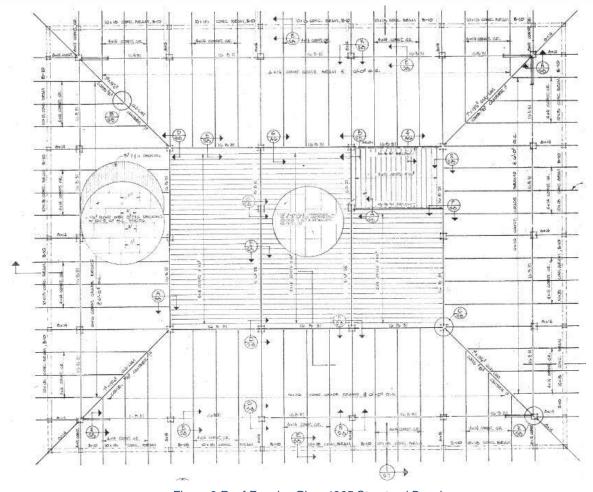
Roof Framing Plan, 1965 Structural Drawings
